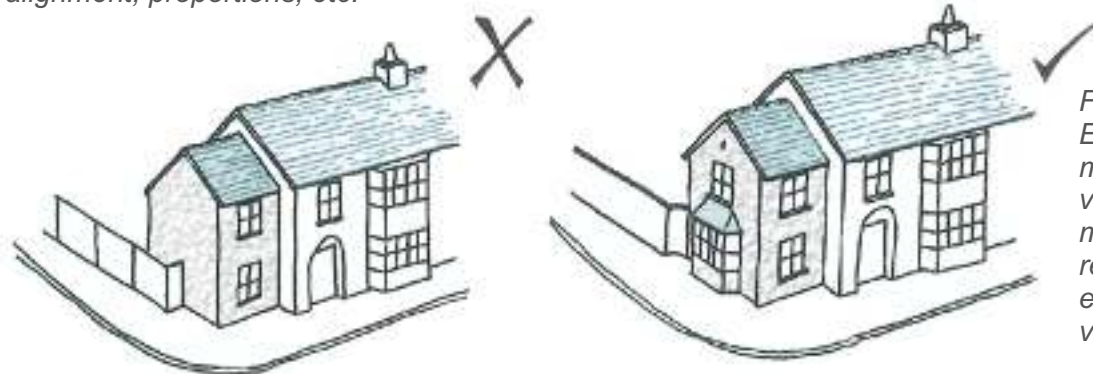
Extensions where multiple faces are visible to the street must be designed to respond effectively to each of those viewpoints.
